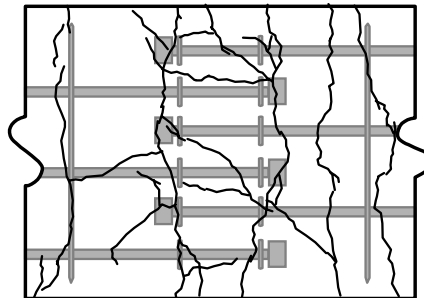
Crack development in a typical hairpin confined lap splice test (specimen LS-08-04.04-12-10(N)-1-H0.6) (continued)
